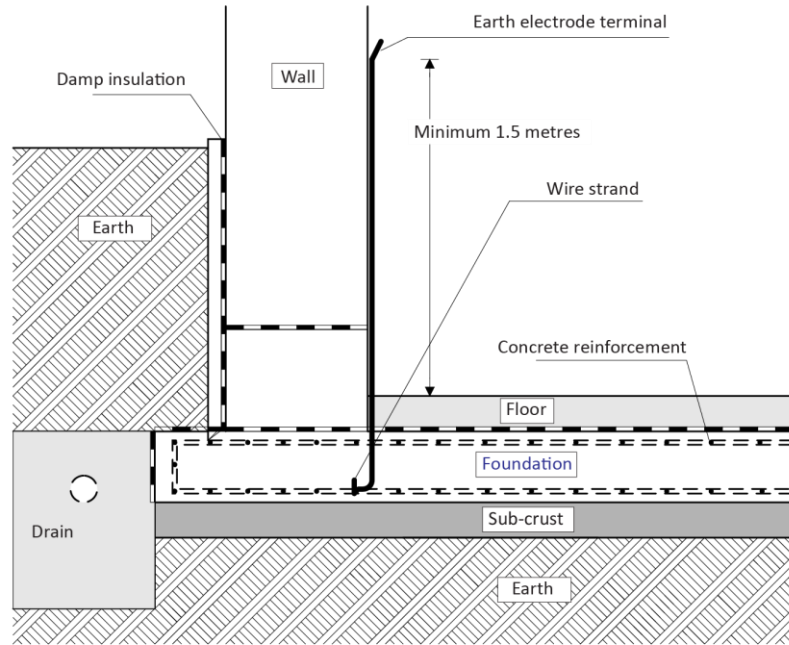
Placement of the foundation earth electrode in a foundation with concrete reinforcement.
